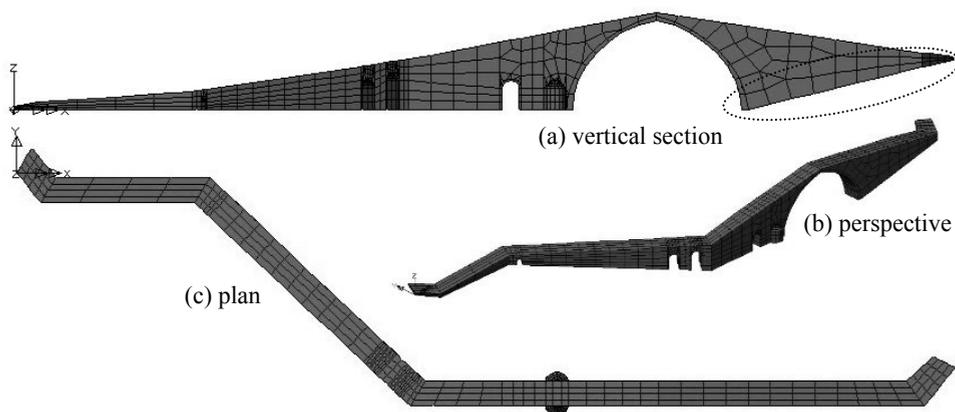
3D Finite element model of the Sample Bridge, (a) view, (b) perspective, (c) plan.
